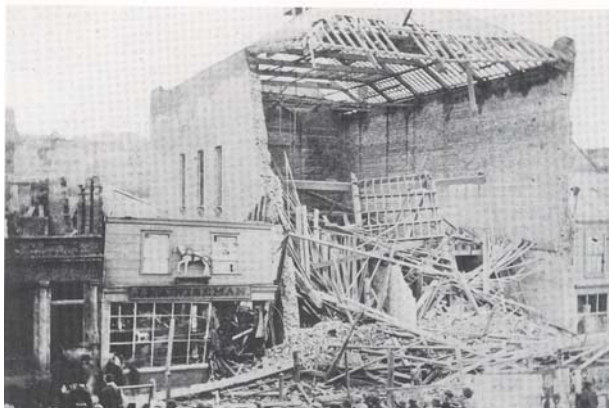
Collapse of a new masonry auction market building, Queen Street, 1865 [Alexander Turnbull Library].
